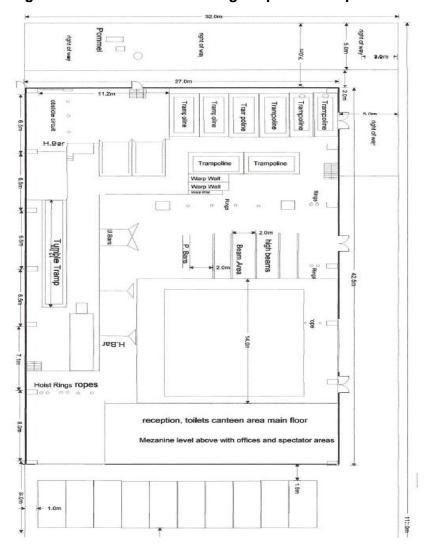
Extract from Planning Proposal - Proposed Building Layout
